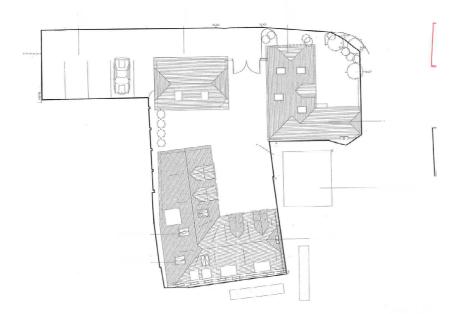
Layout of the scheme (two dwellings and garages) approved at the site
